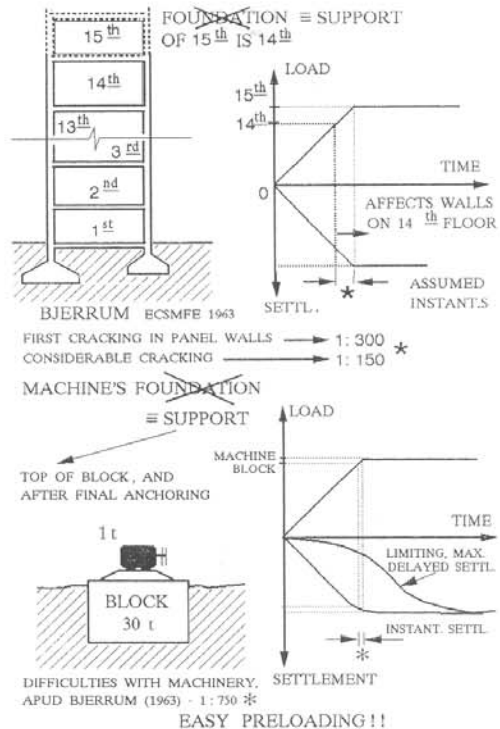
Recommended use of "SUPPORT" instead of "FOUNDATION" for improved logic and great savings on many cases.
